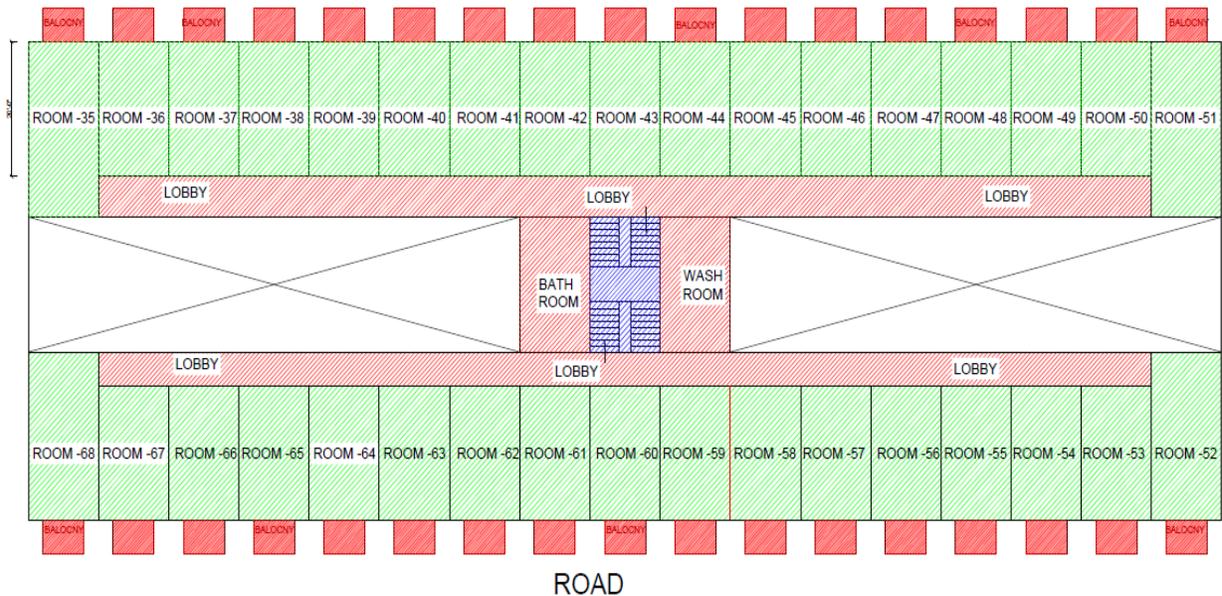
1st and 2nd floor damage contour (1st and 2nd floor have the same plan as far as damage contour drawing is concerned)
